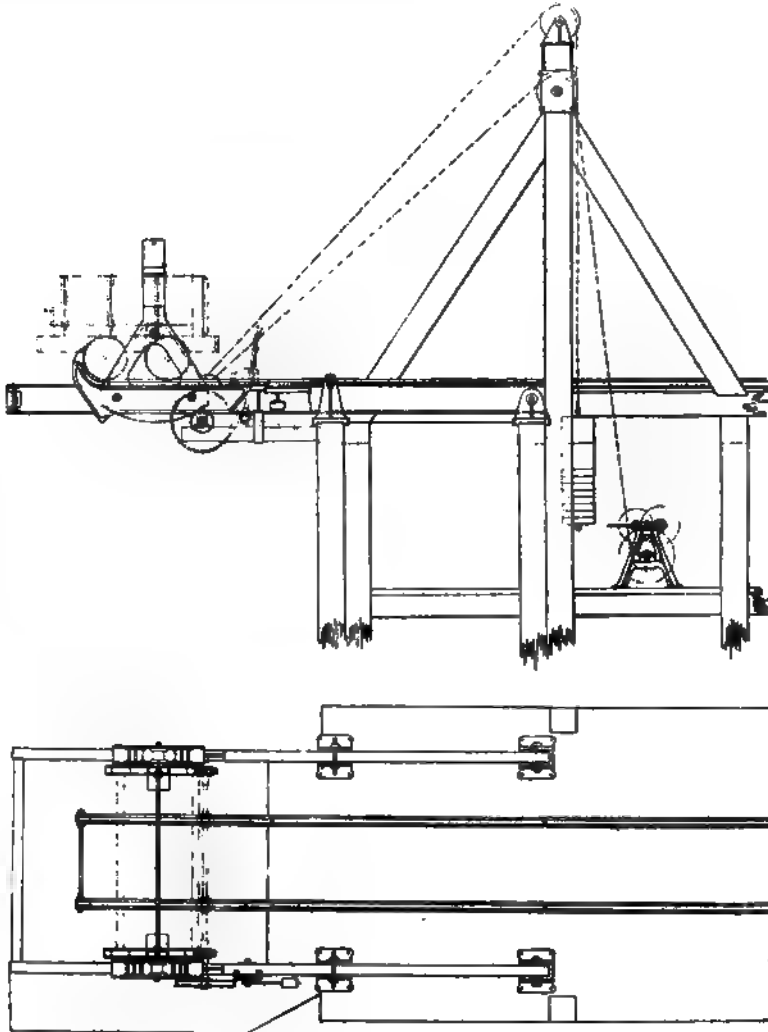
Plan and Elevation of Stevenson's Coal Tips.
